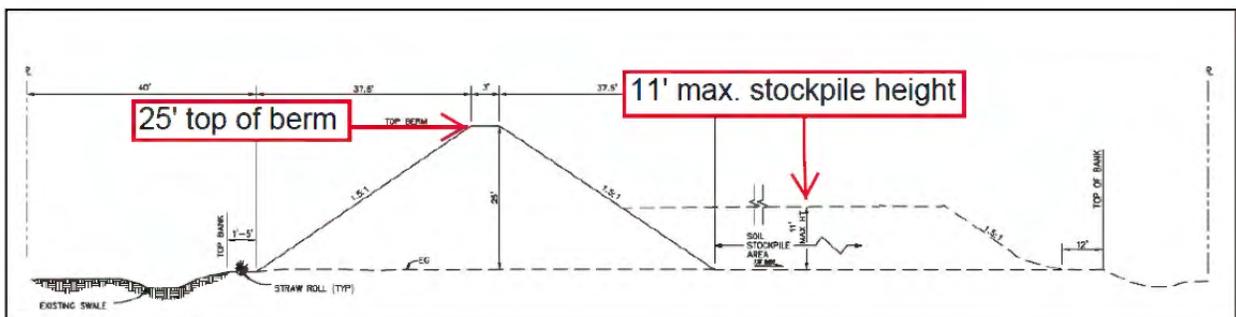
Proposed Berm and Soil Stockpile Cross-section, from Figure 2 Proposed Grading and Stockpile Plan (Source: Carlile Macy, January 2018)
